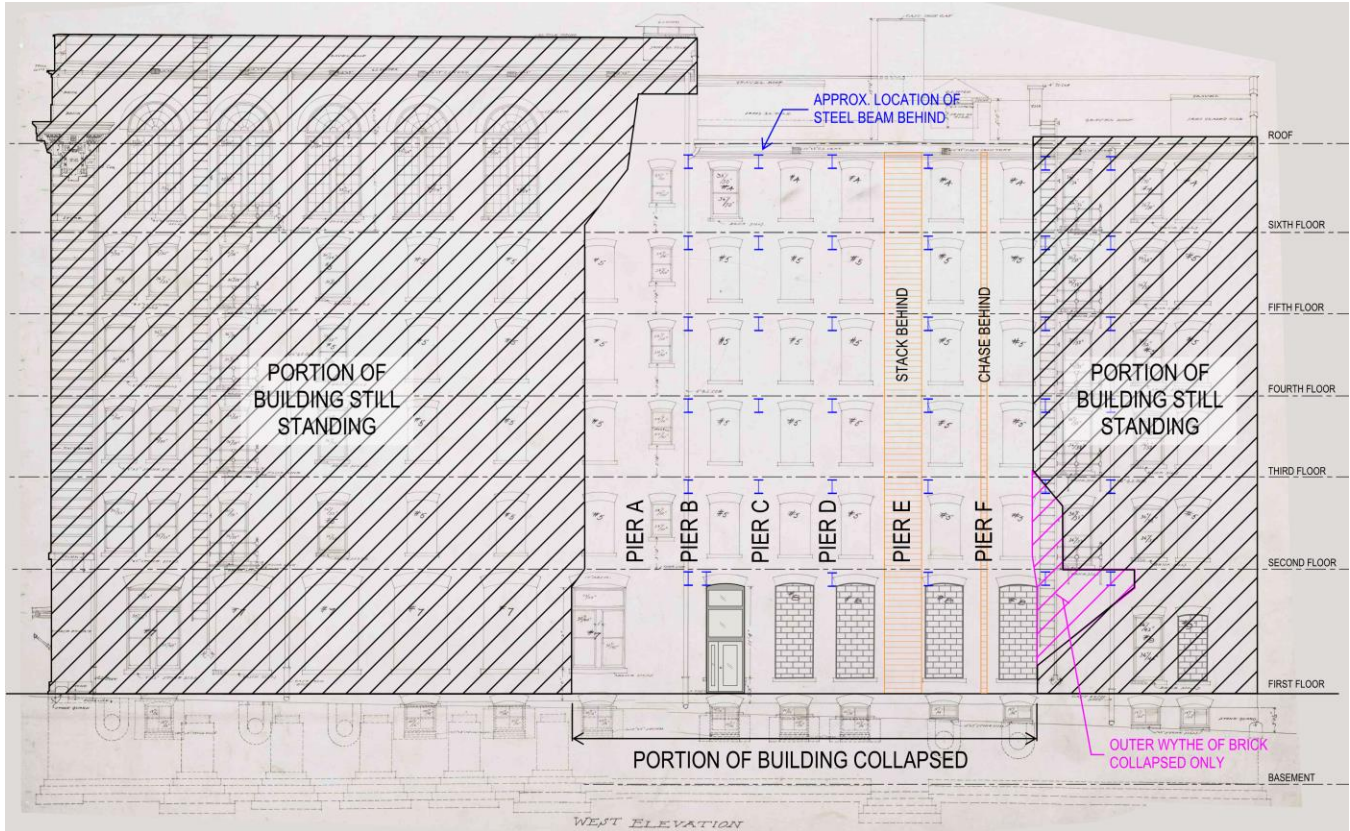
West elevation view indicating the portion of the elevation that collapsed on May 28, 2023.
